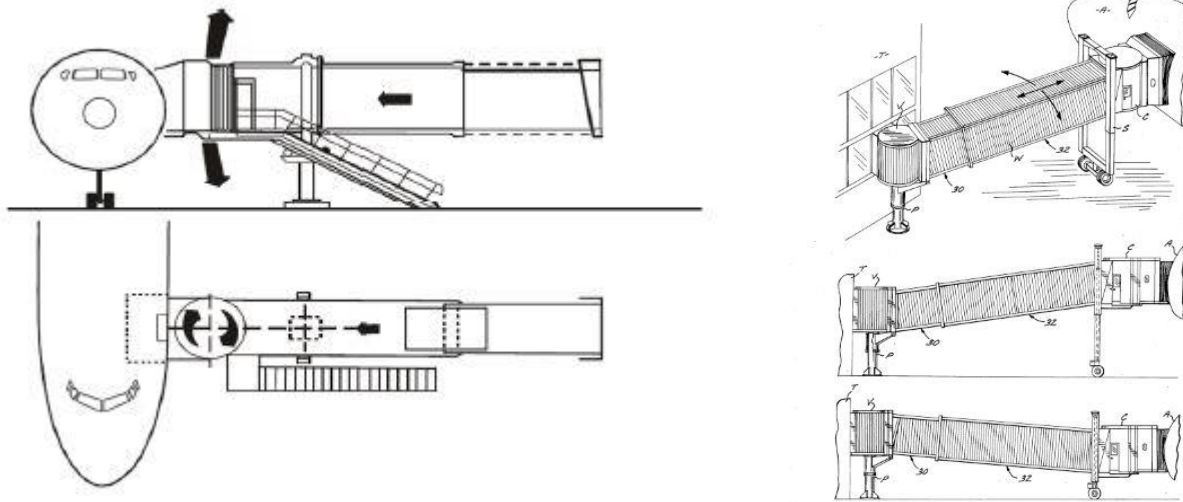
A jet Bridge (source: Apron Planning and Design Guidebook)
